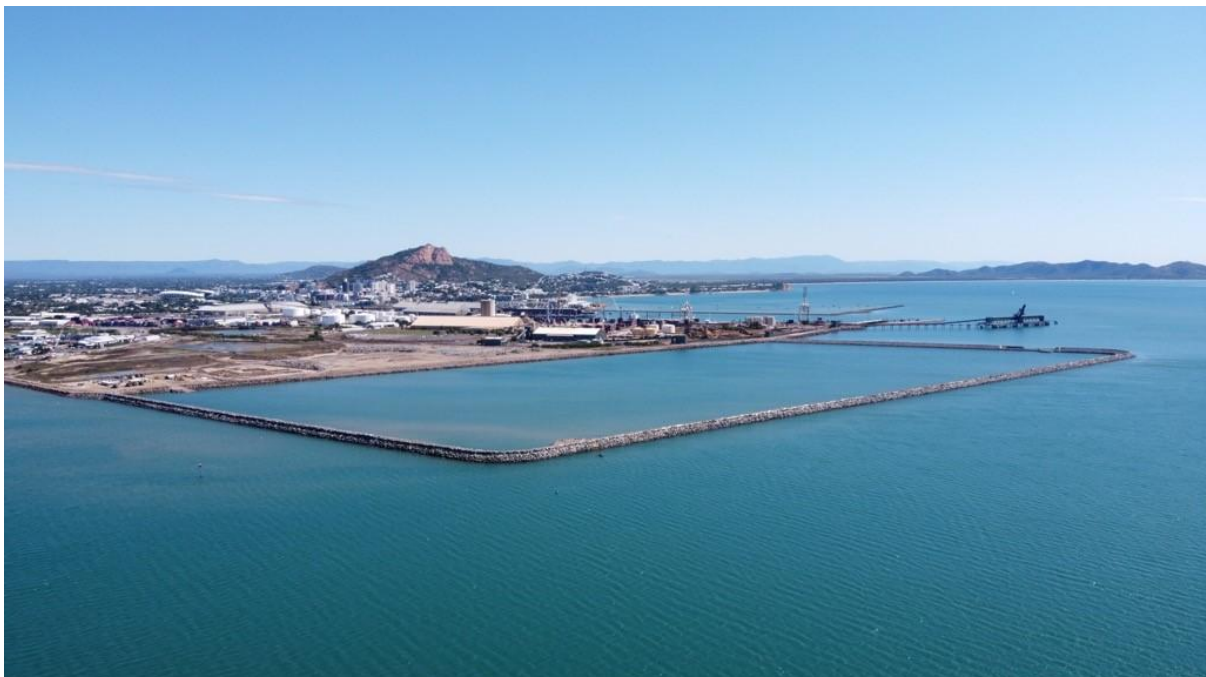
The 2.2km rock wall achieved practical completion on 17 June 2021.
